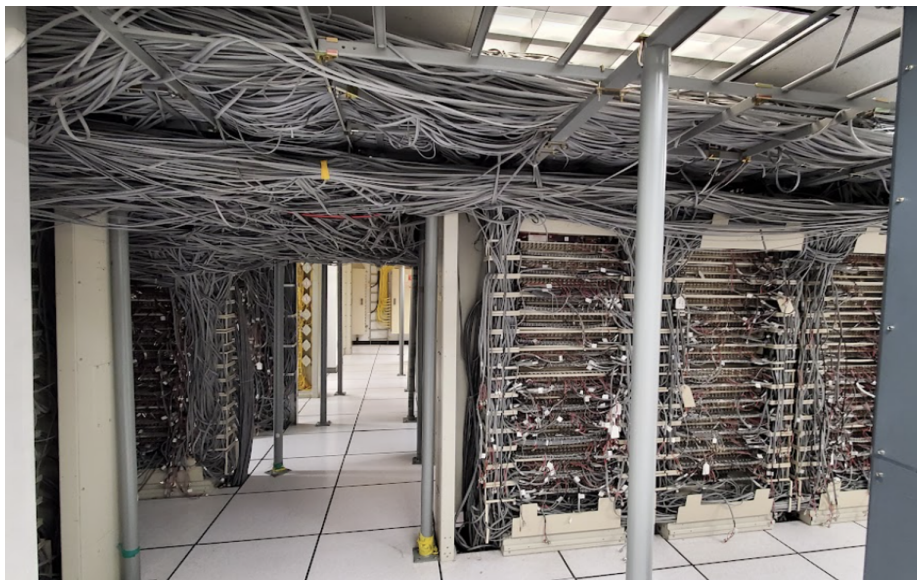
Picture taken showing extensive wiring in place across a floor of central office.
